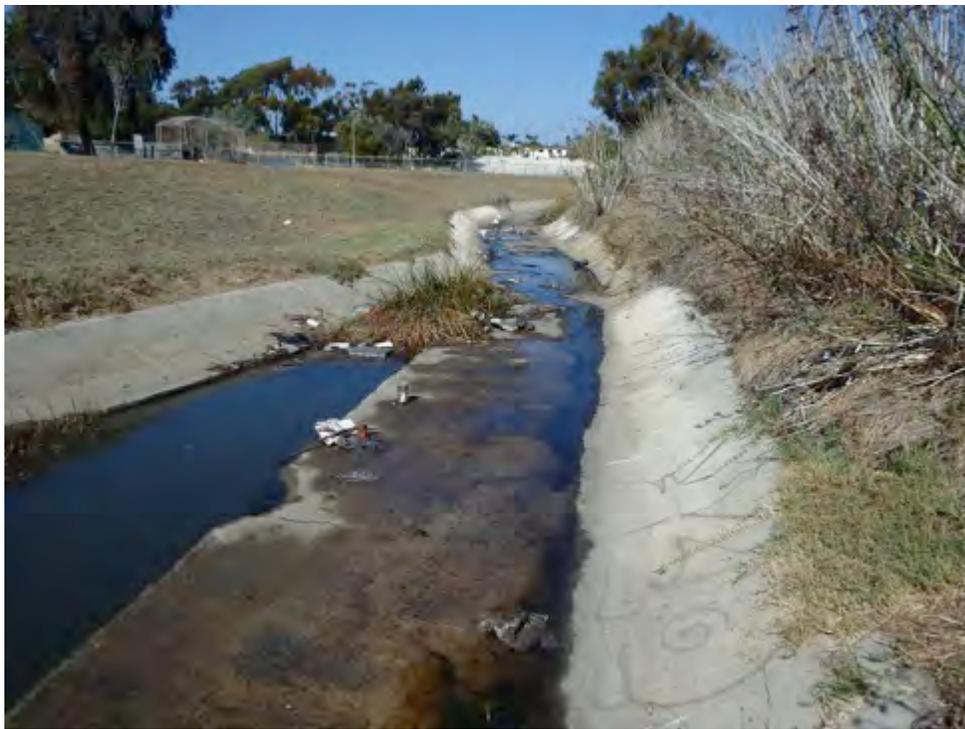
Overview of Paradise Creek concrete lined channel southeast of the pedestrian bridge. Wetland vegetation is confined to the concrete channel. Southeast facing. November 10, 2014.
